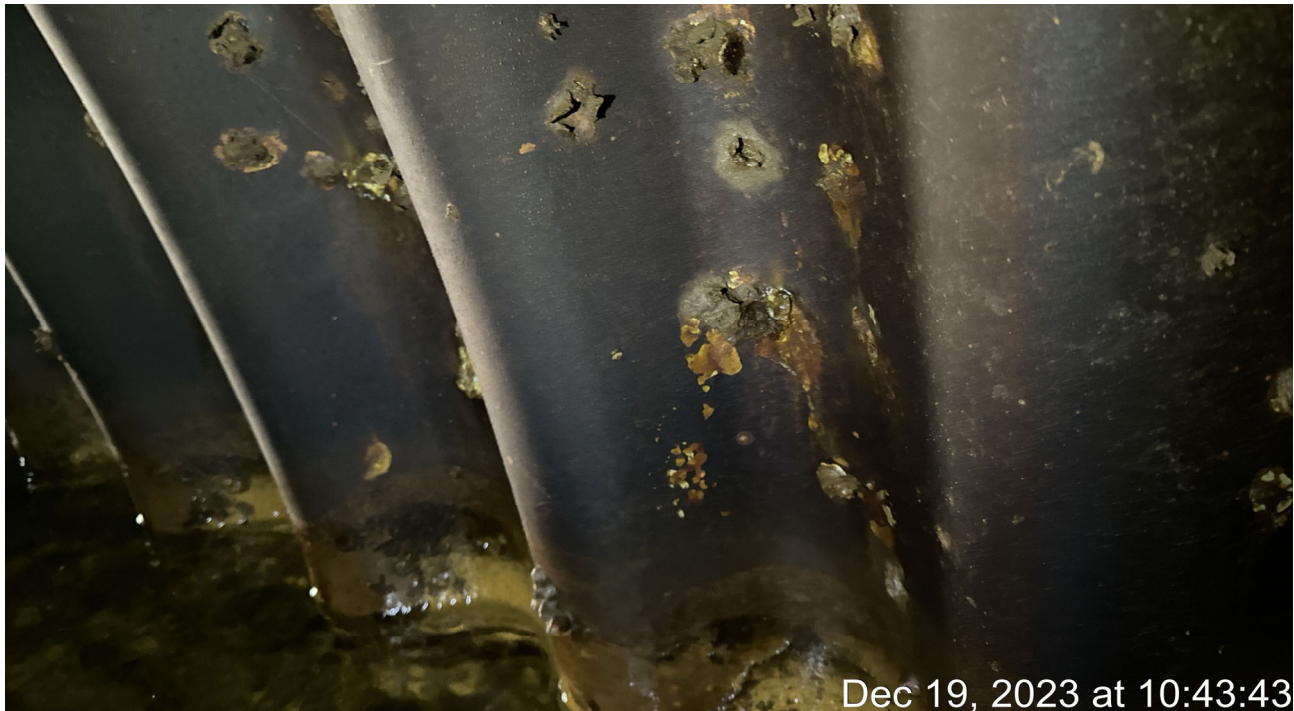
Heavy pitting and holes as observed on a portion of the half-arch culvert sidewalls.
